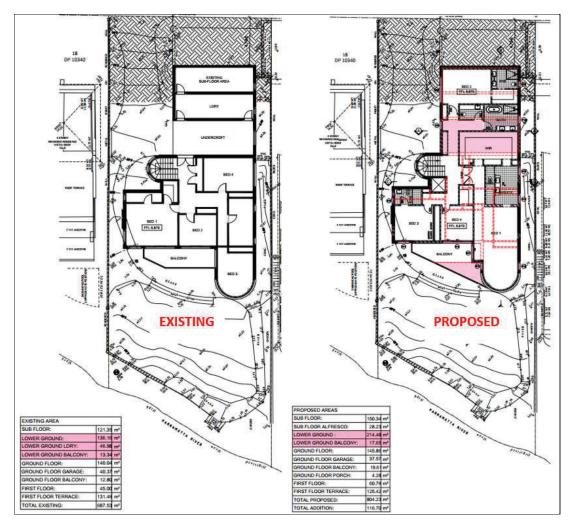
Proposed floor plan changes to lower ground floor level. Source: Architectural Plans prepared by Construction by Design
